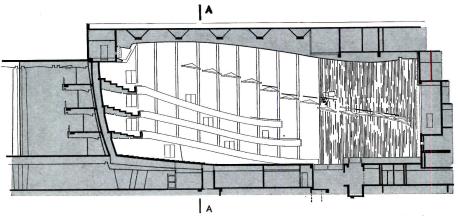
Longitudinal section of Philharmonic Hall along the centerline. Total seating capacity is 2,644 divided as follows: orchestra (main floor)—1,384; loge (first balcony) -392; first terrace-454; second terrace-414
